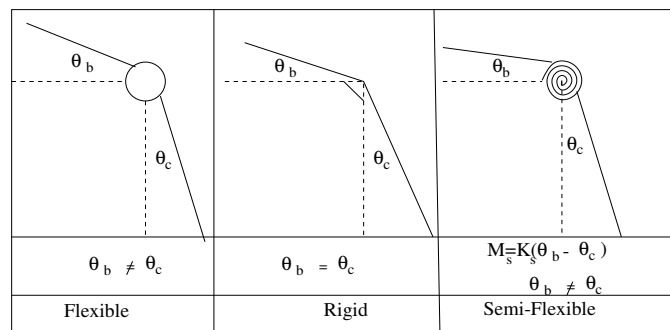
Flexible, Rigid, and Semi-Flexible Joints
